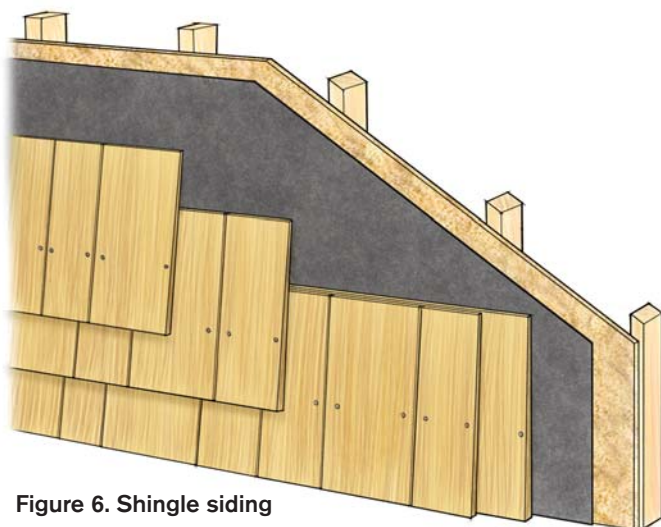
Shingle siding is lapped in a way that means it's penetrated by two, and sometimes three, rows of nails. Because the individual pieces are much smaller than most other sidings, though, replacement of damaged shingles is simplified.
